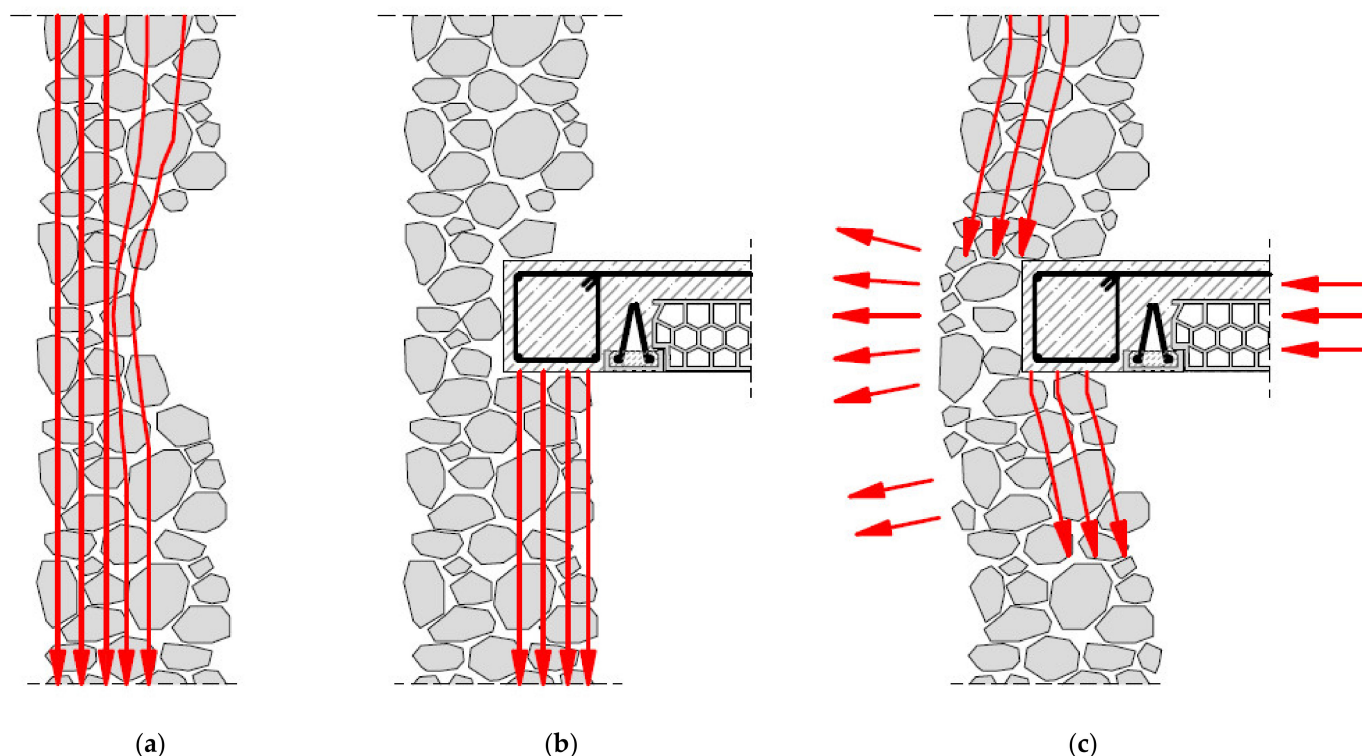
Scheme presenting changes in the load arrangement after replacing a timber floor with a concrete floor: (a) stress redistribution, (b) high compressive stresses due to the addition of the new floor, (c) punching shear action. Based on [1].
